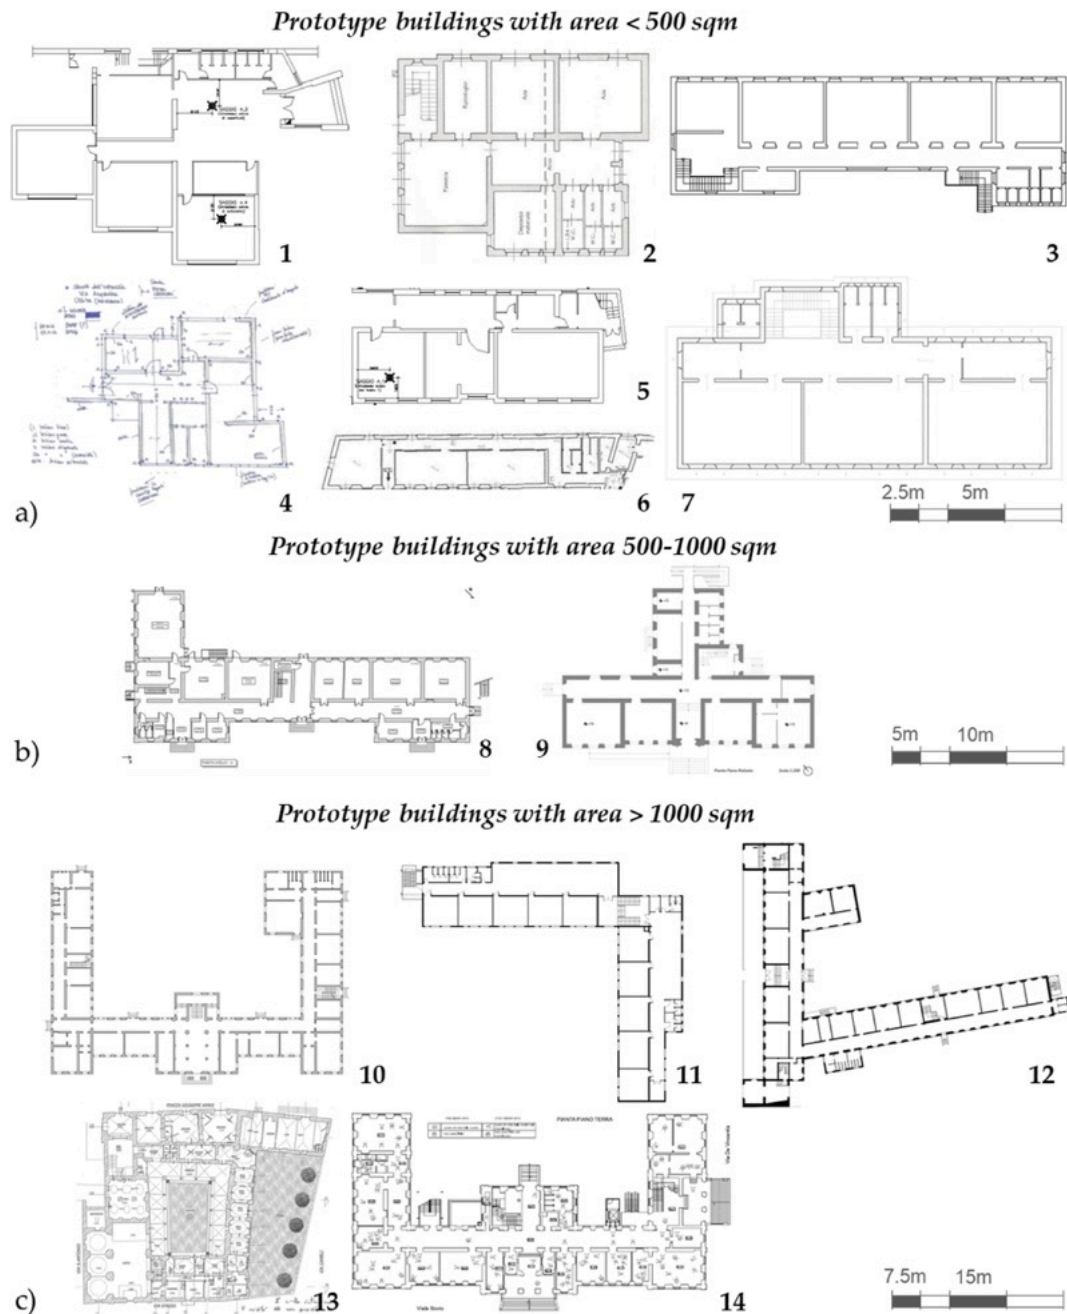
Figure I. Floor plans of URM school building archetypes distinguished by plan area < 500 sqm (a) plan area 500-1,000 sqm (b) and areas > 1,000 sqm (c).
